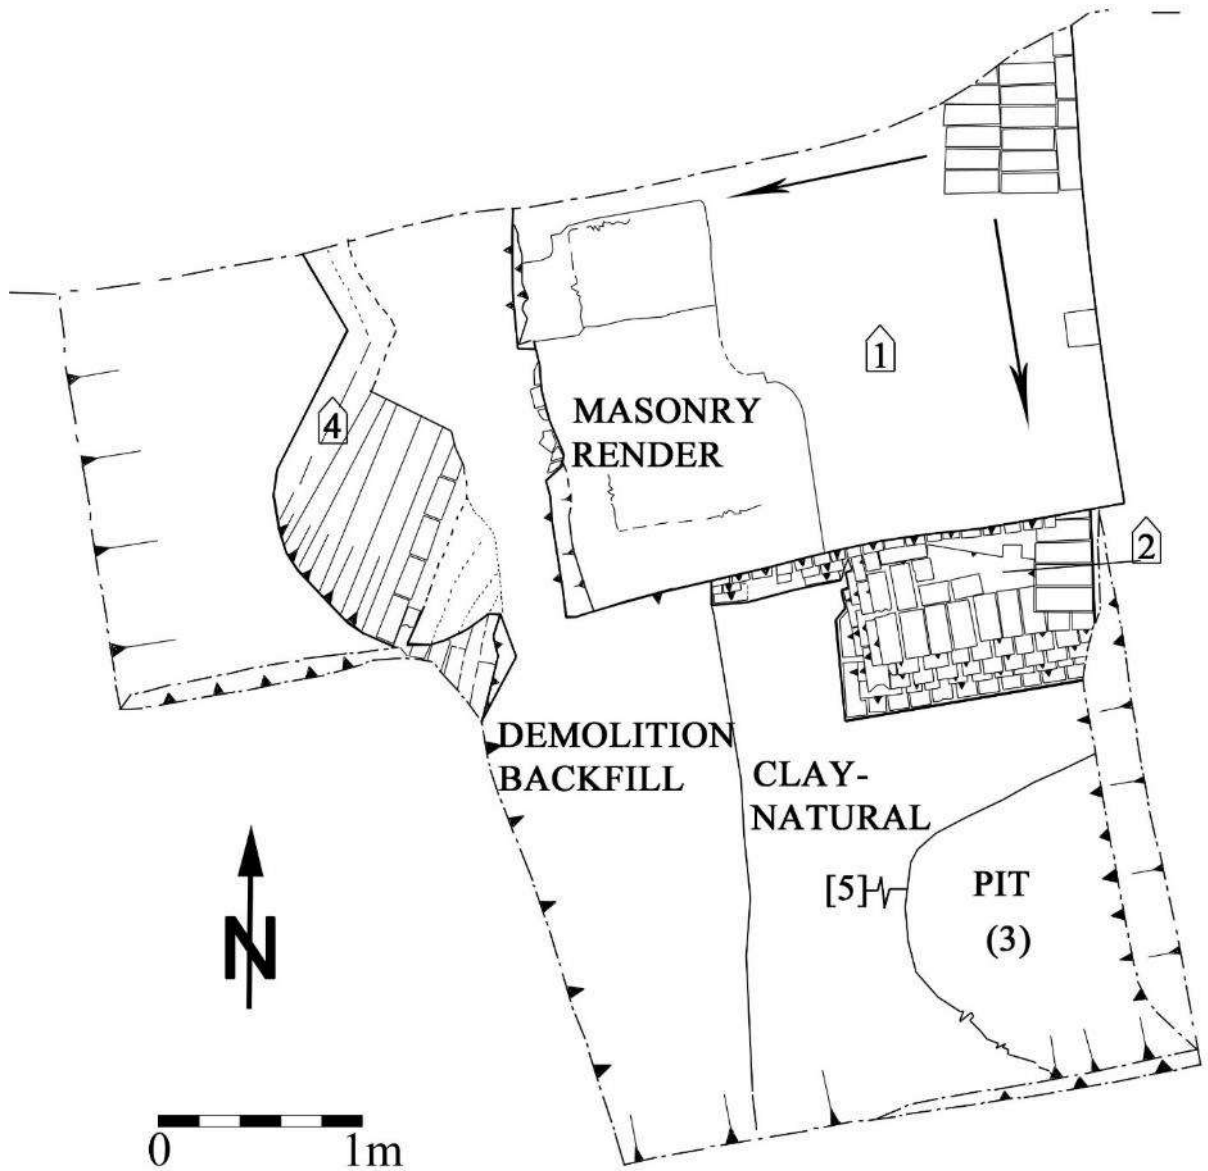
Plan of railway viaduct footing. Original Drawn at 1:20.
